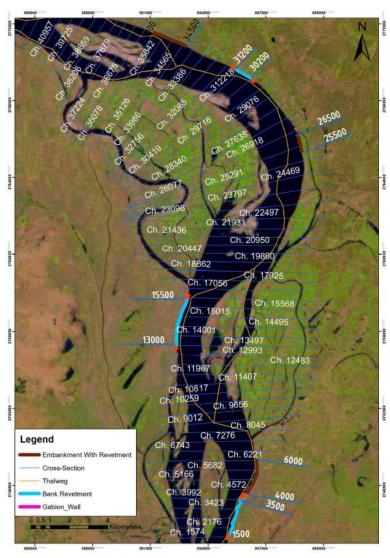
Layout of Proposed River Bank Protection Works in Kaliachak reach of Ganga-Padma River System
